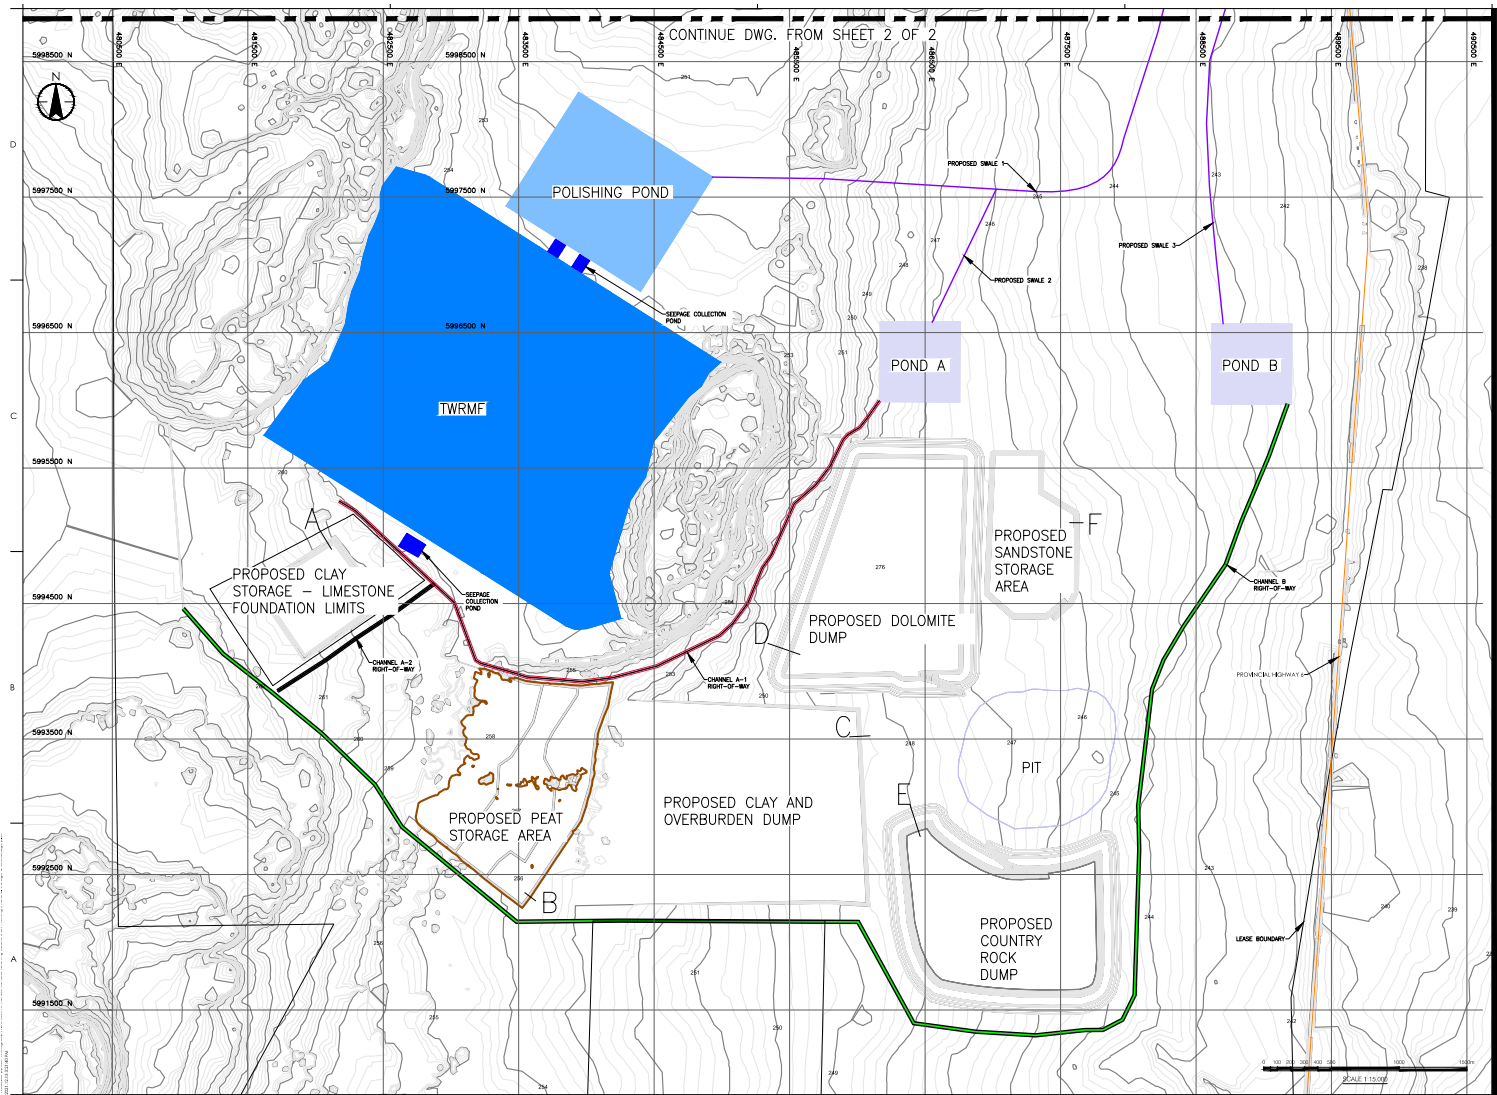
Minago Project site layout as proposed by Flying Nickel (From Stantec 2021).
